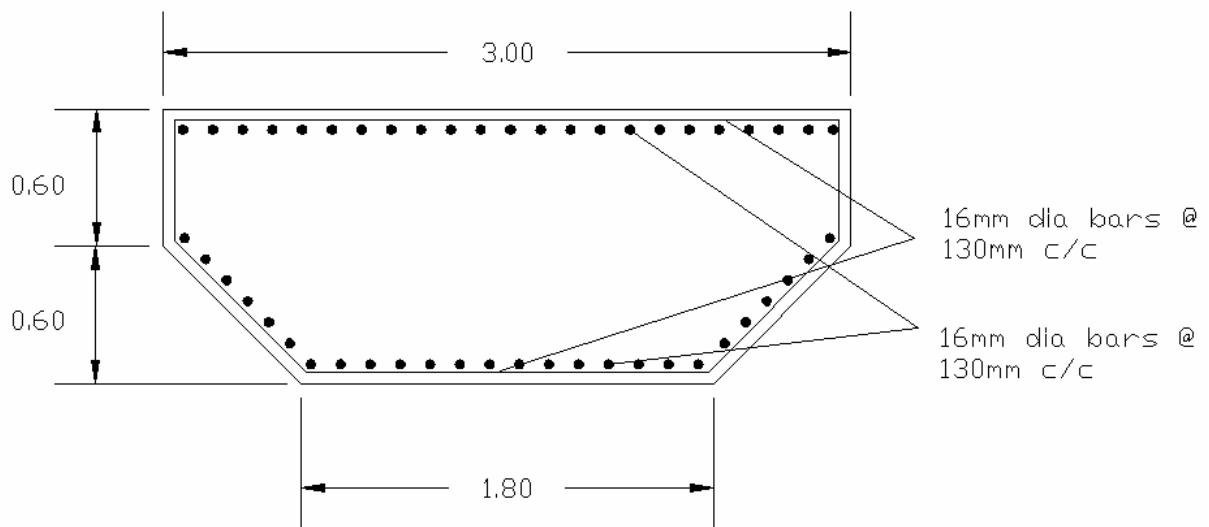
REINFORCEMENT DETAILS OF PIER CAP
